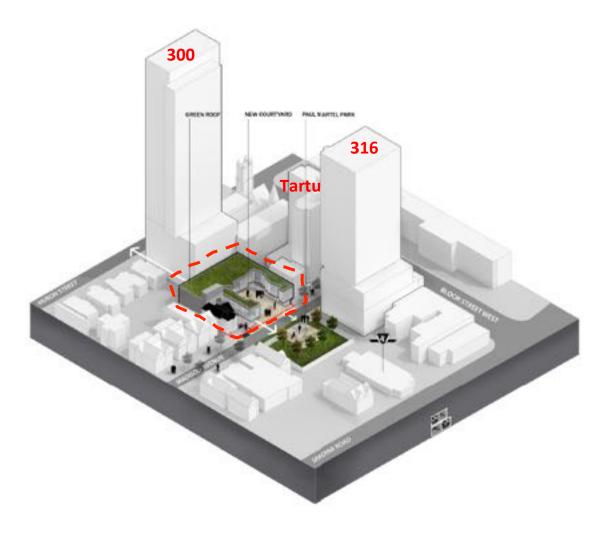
, Site Axonometric (Subject site is indicated by the red dotted line)
